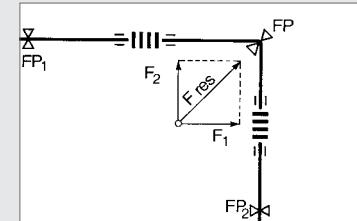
Offset system with axial expansion joints and elbow anchor
